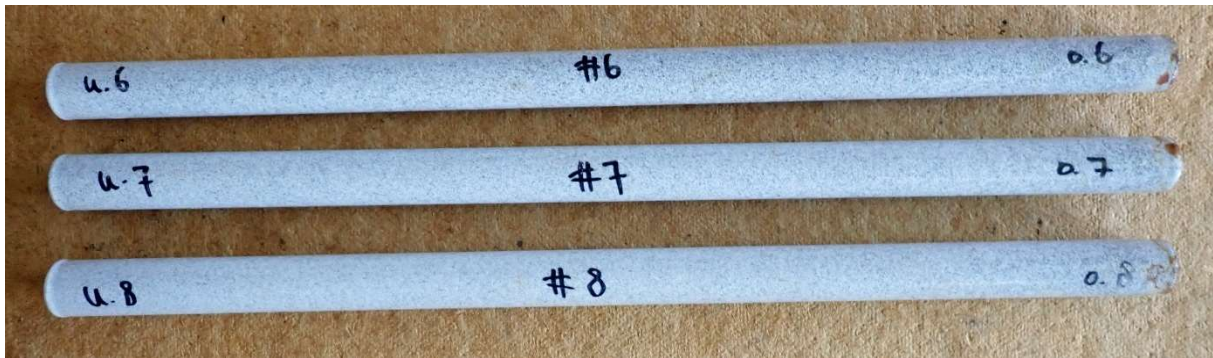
Opposite side surfaces of the dowels after NSS-test without signs of corrosion or fissuring in the coating
